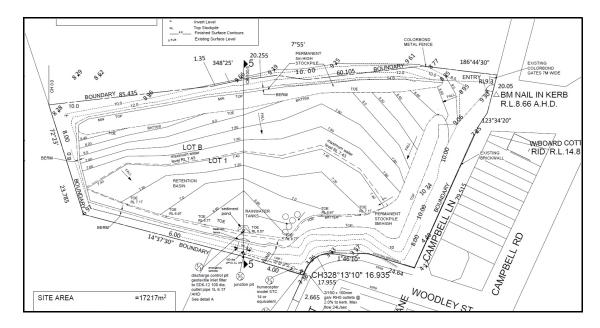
Extract from Sheet 3 of Drawing No.9167-12 at Appendix 8.
